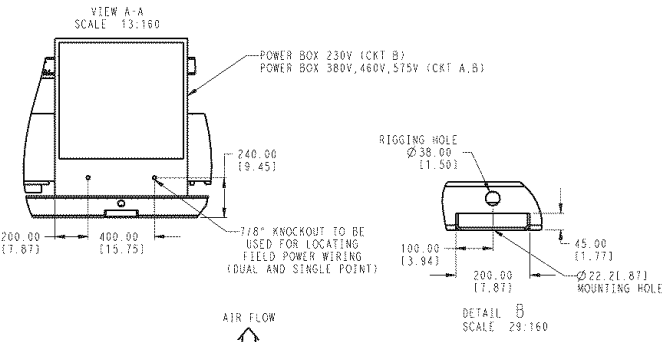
30RB120 Air-Cooled Chiller Dimensions
